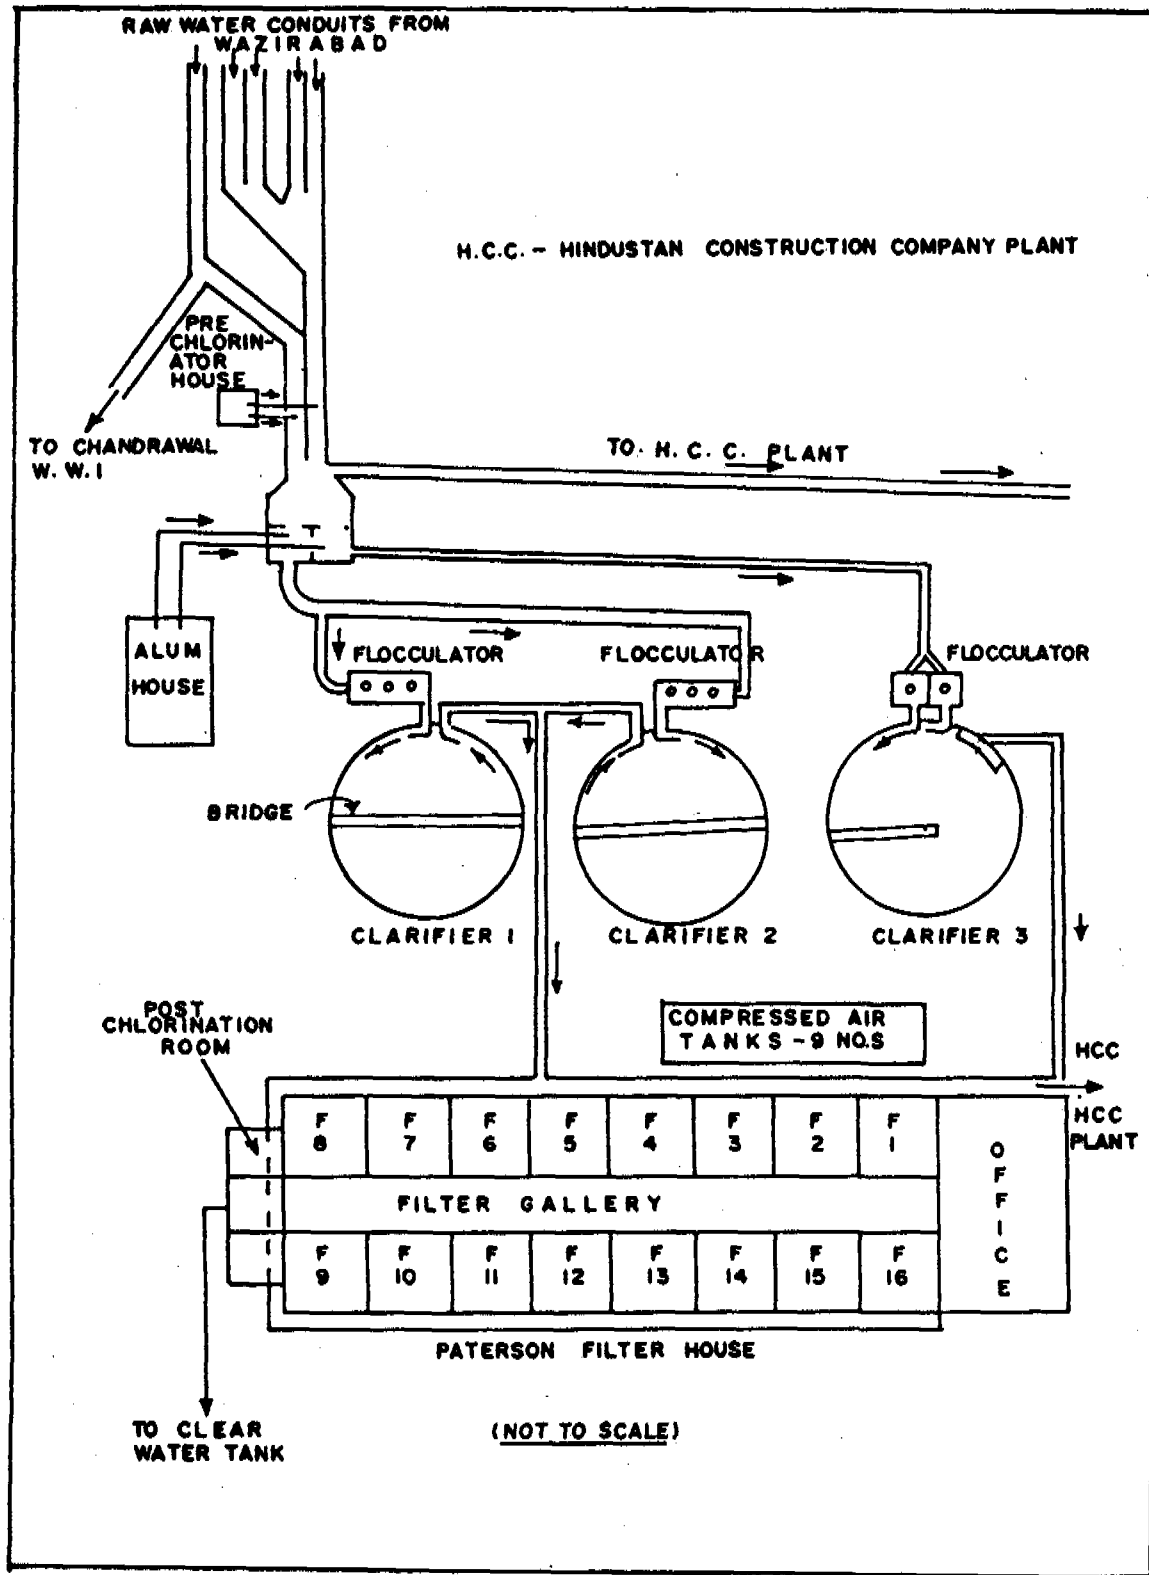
LAYOUT PLAN OF PATERSON WATER TREATMENT PLANT - DELHI
